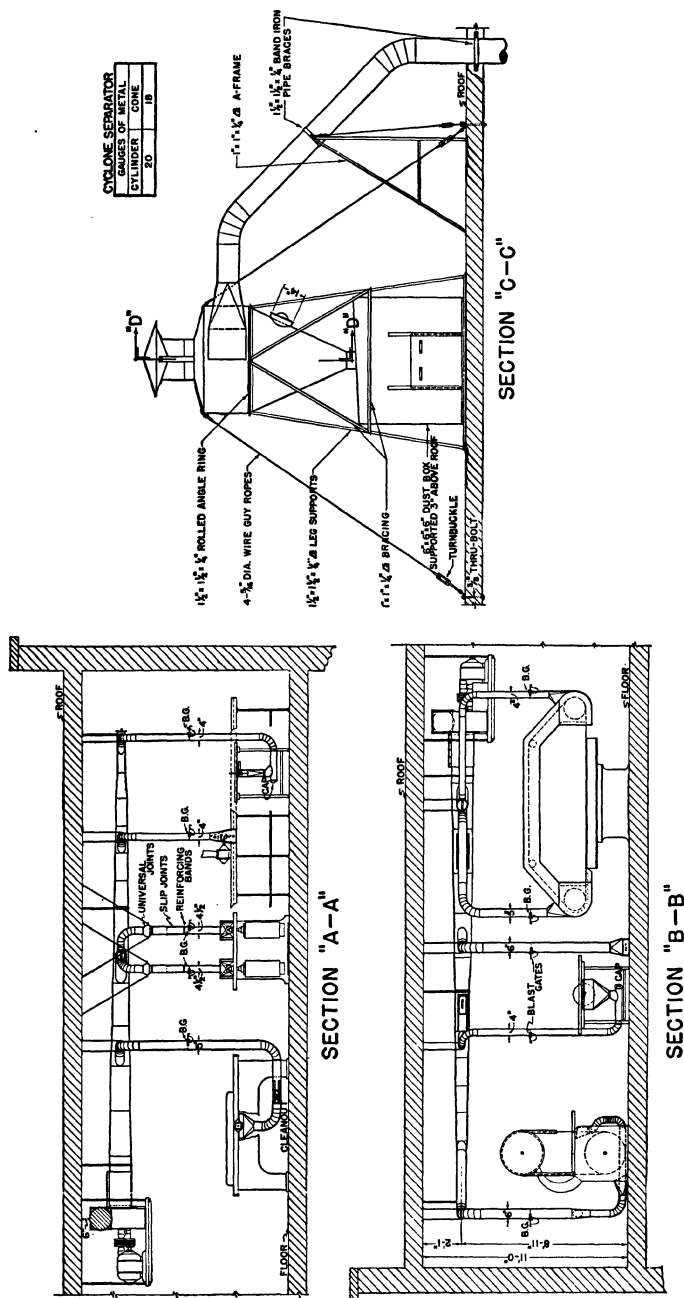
Exhaust-System Layout for Typical Woodworking Plant (Courtesy N. Y. Labor Department, Division Industrial Hygiene and Safety Standards)
